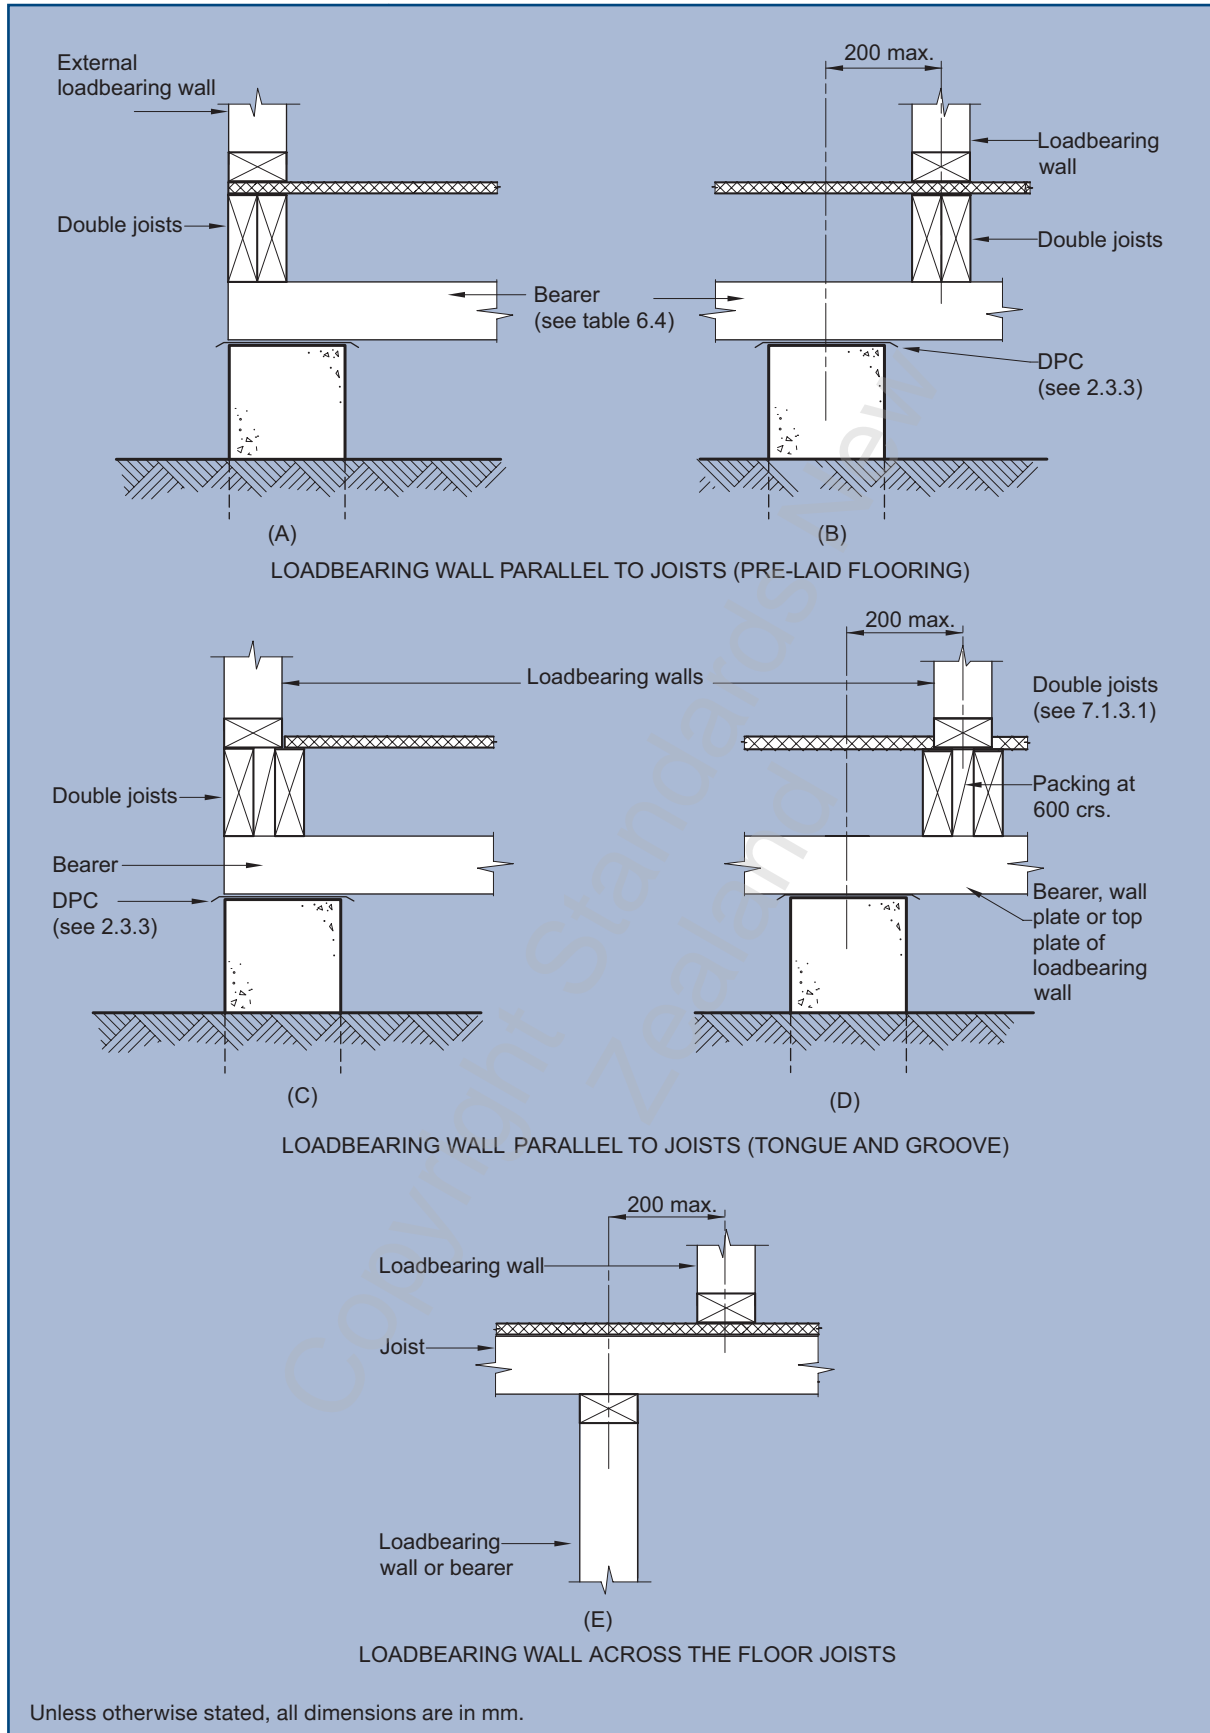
Support to floor joists under loadbearing walls (see 7.1.3)
